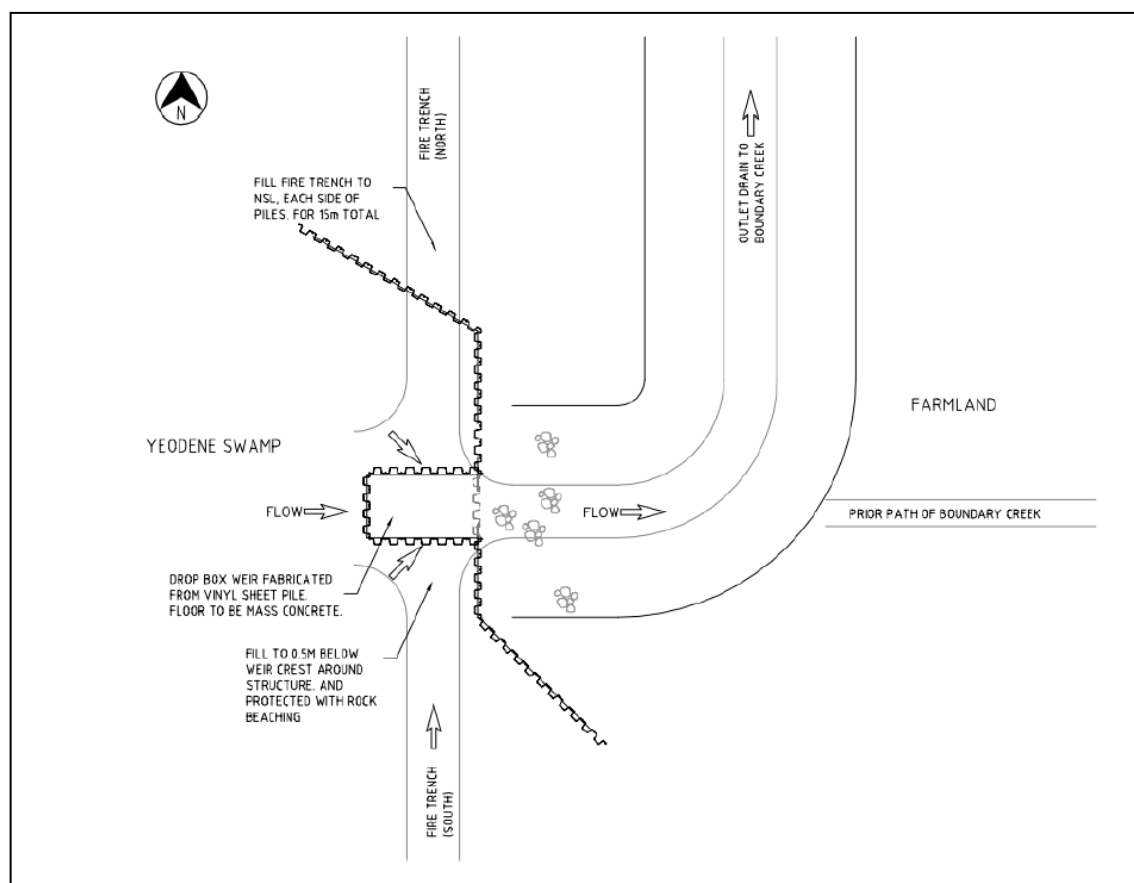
Location of Hydraulic Barrier (Jacobs, 2018b)
